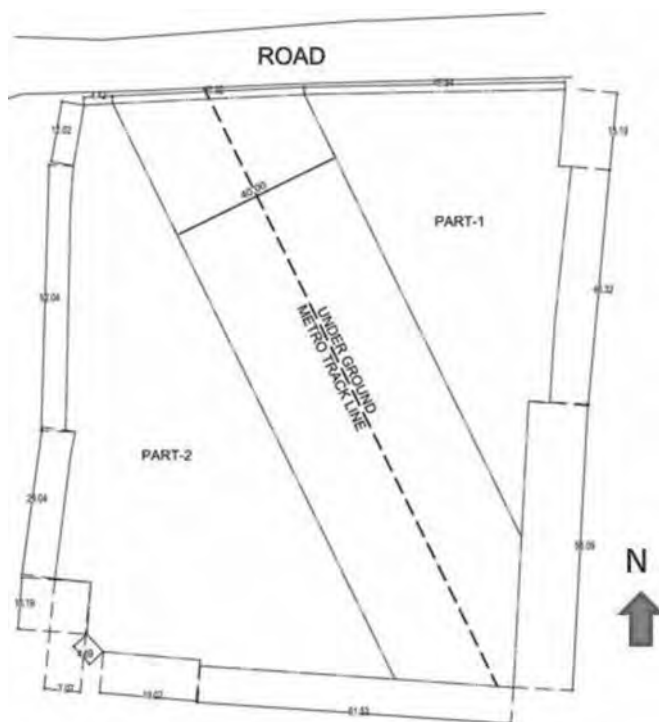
Site plan showing the division of site due to the proposed underground metro station.
